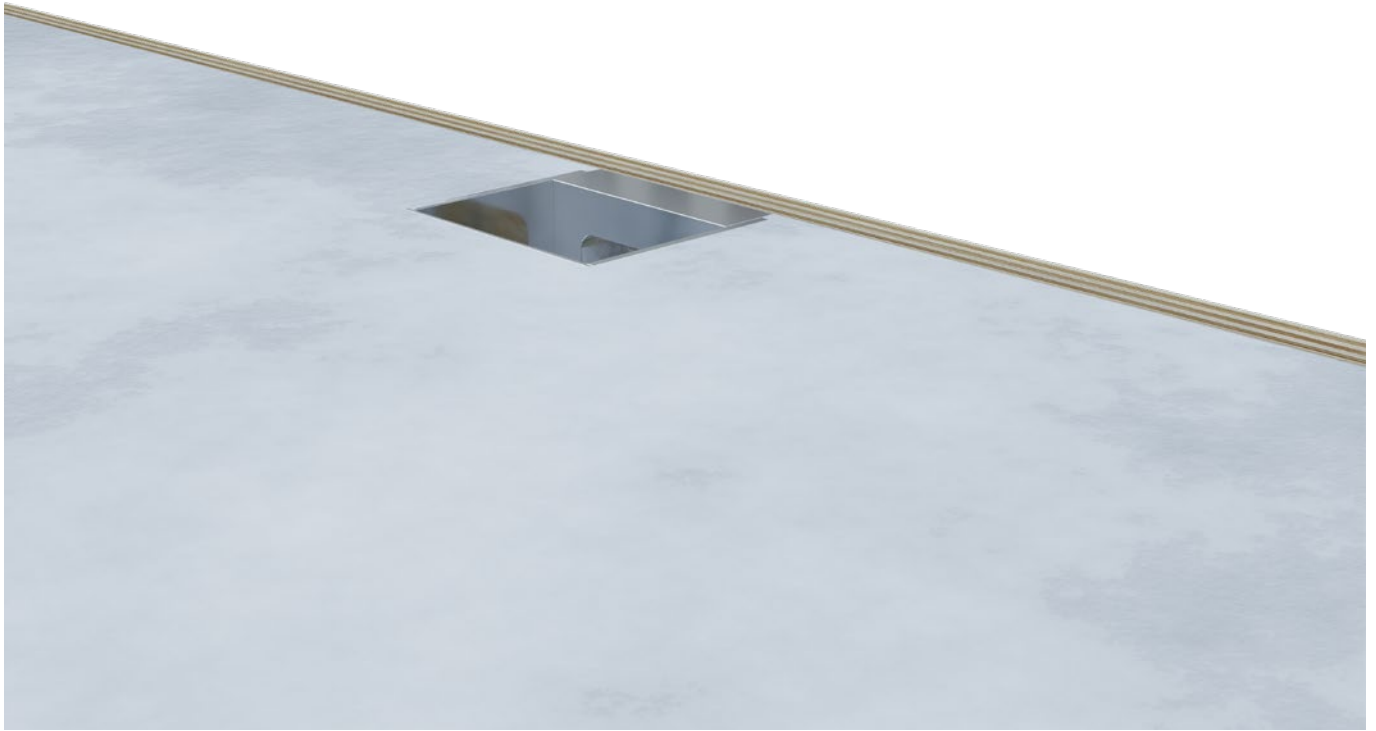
REMOVING OF THE PRECAST CONCRETE ELEMENT FROM FORMWORK. GRIP CREATED IMPROVED ROUGH SURFACE IN FUTURE JOINT AREA.
